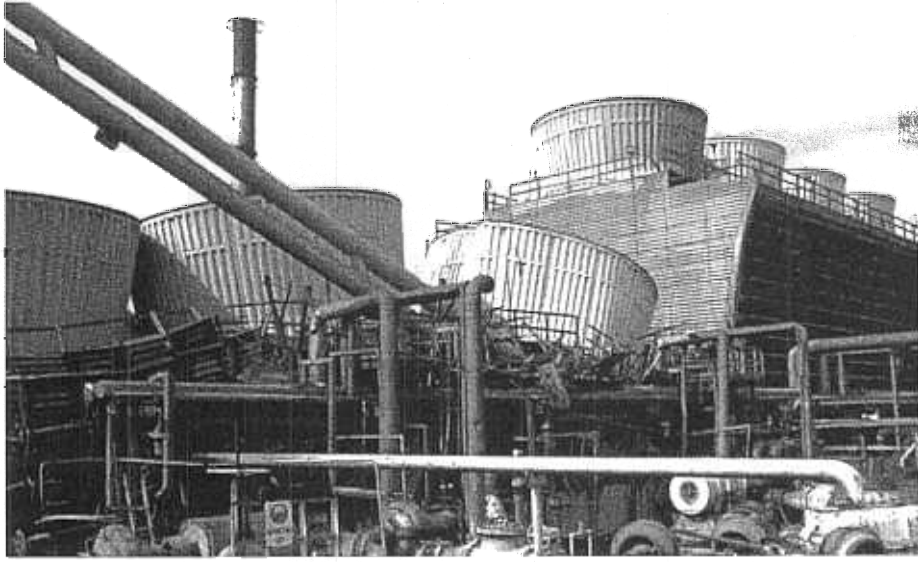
Collapsed wooden cooling towers at the Petkim petrochemical plant. Instrument at the site measured peak horizontal acceleration at 0.32g. (Photo: Johnson)
